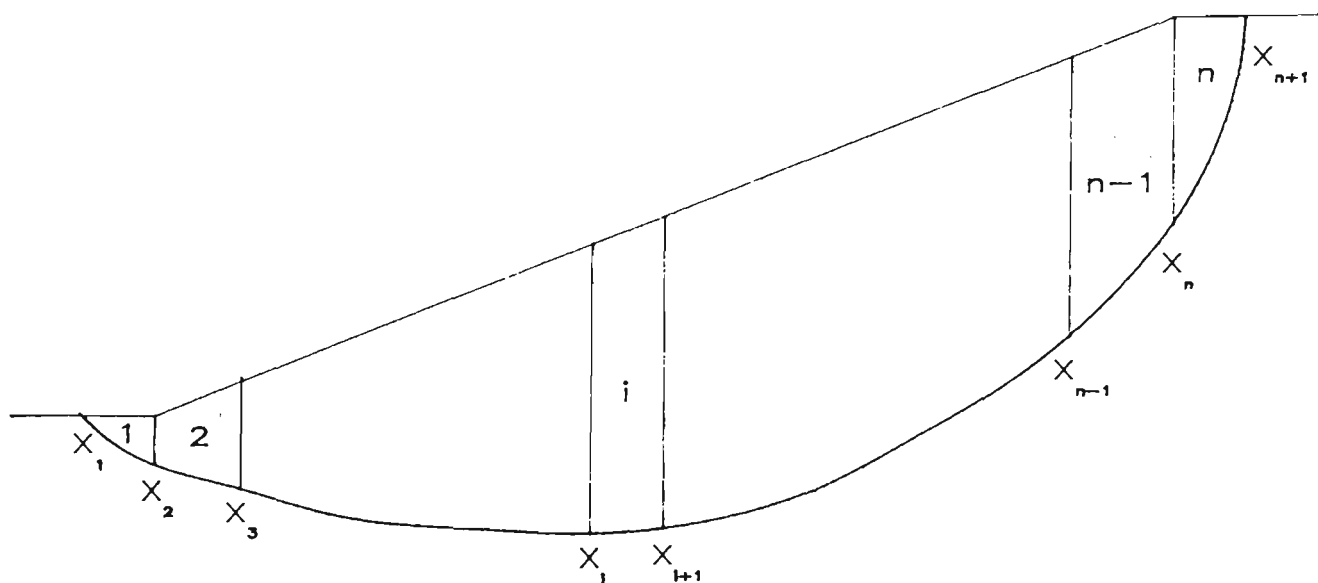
Slope Cross Section with Typical Slice Coordinates
